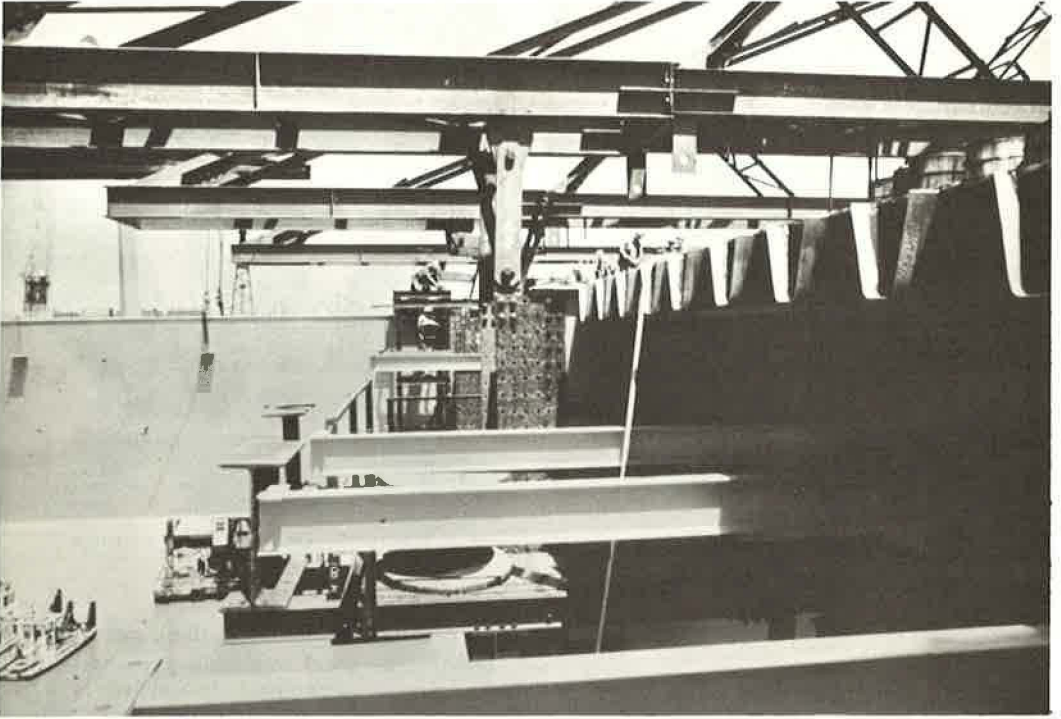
End of central unit—the wide-flange beams are the rails for the traveling scaffold (a traveling truss is in the background).
